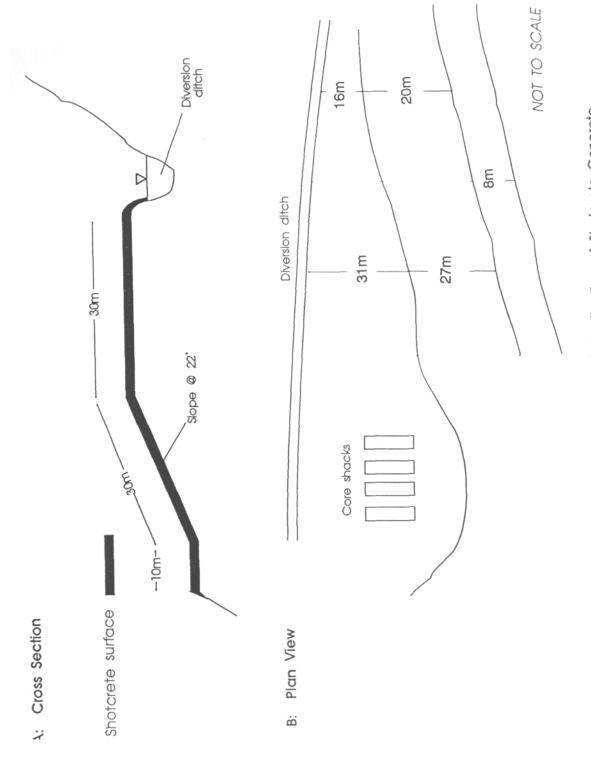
Schematic of Large Scale Field Application of Shotcrete Concrete
